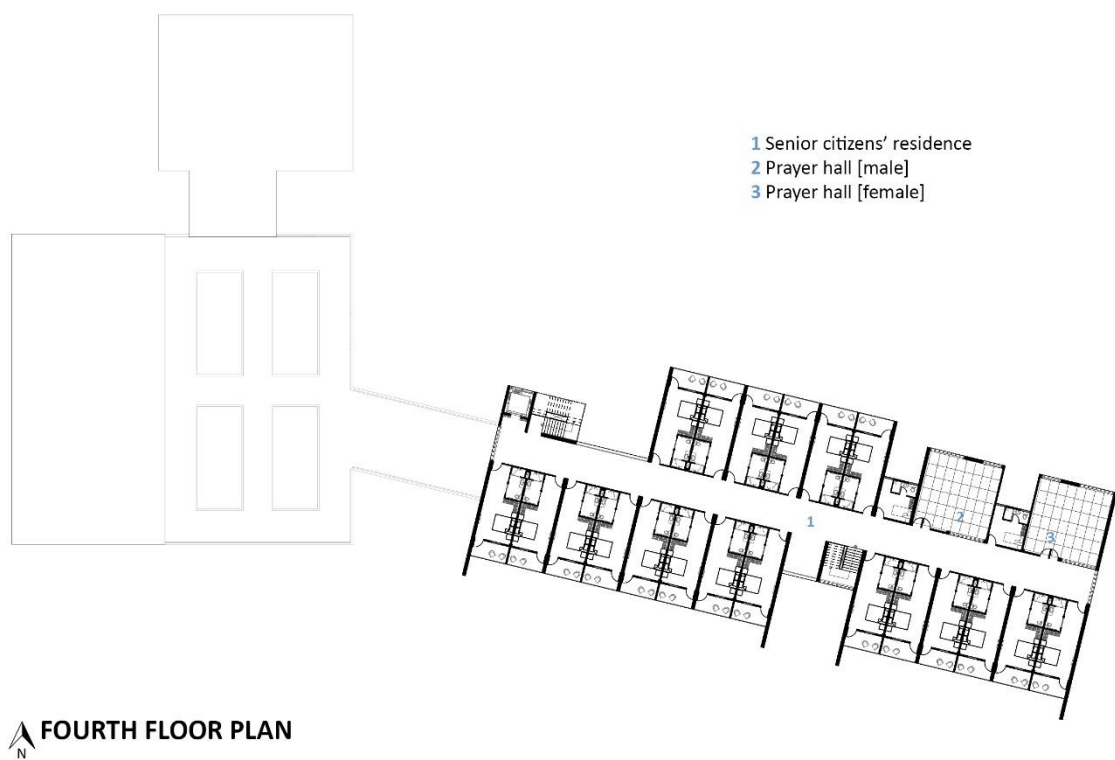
Fourth Floor Plan (Source: Author)
